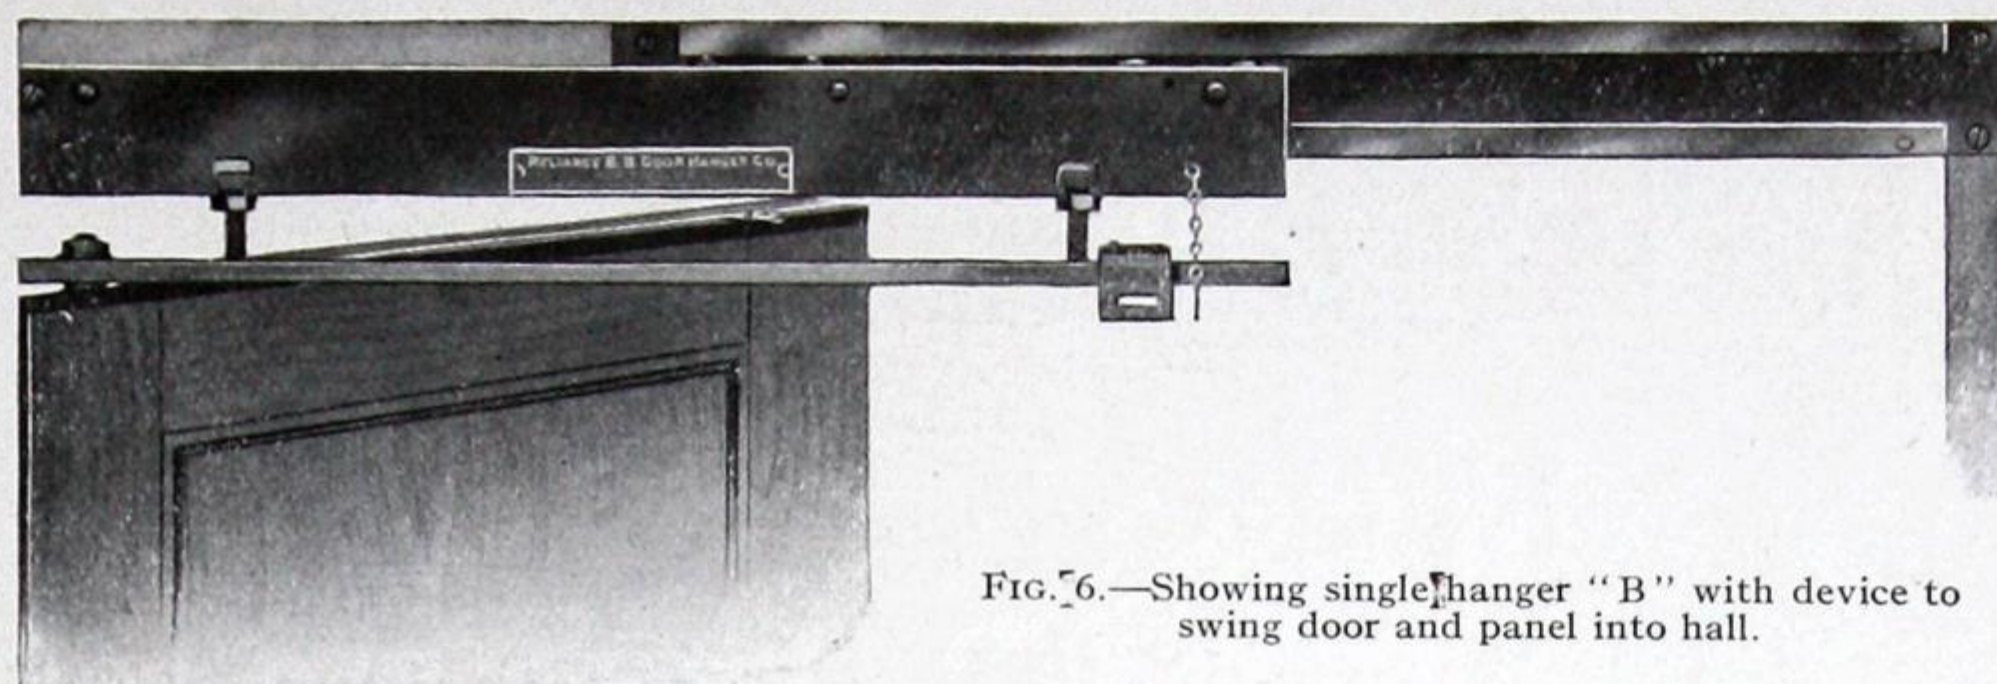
Showing single hanger "B" with device to swing door and panel into hall.
